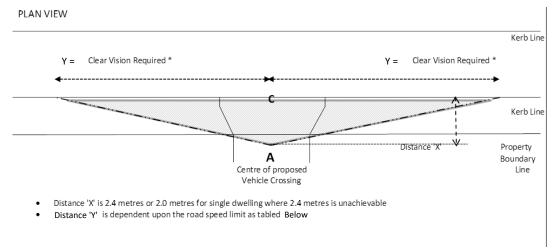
Typical sight lines at junctions/accesses (MfS)
